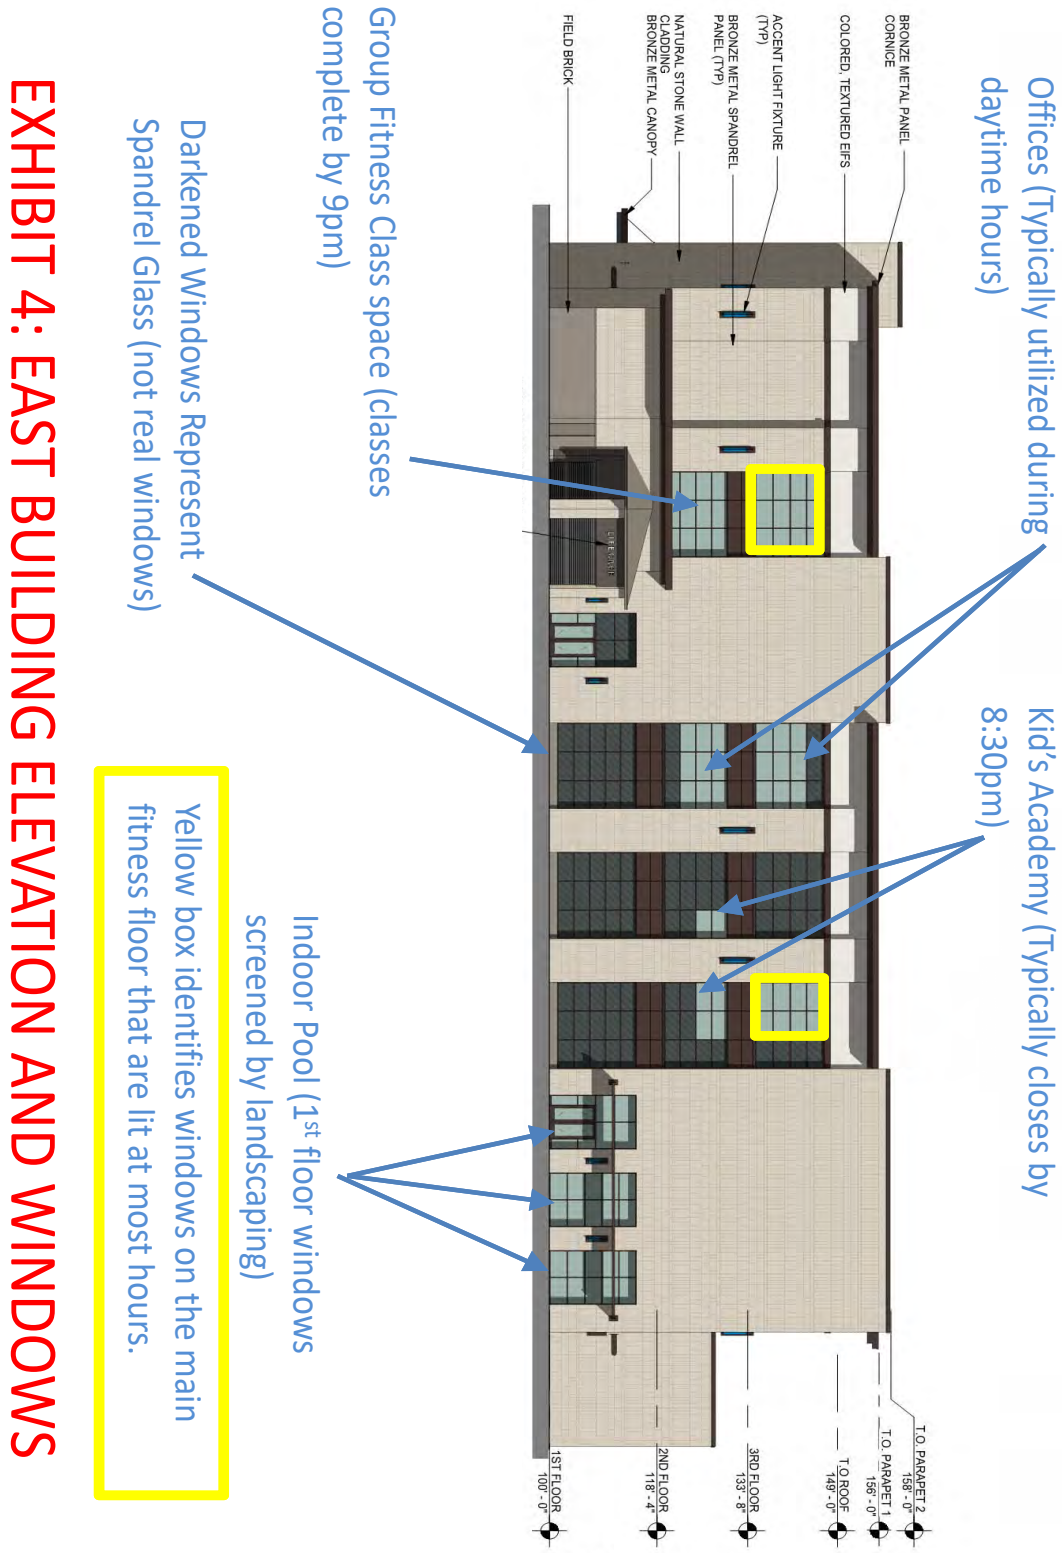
EAST BUILDING ELEVATION AND WINDOWS
